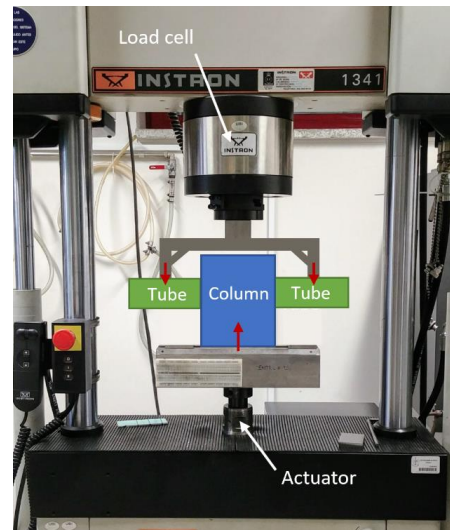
Possible alternative setup for testing the tube-to-column connection
